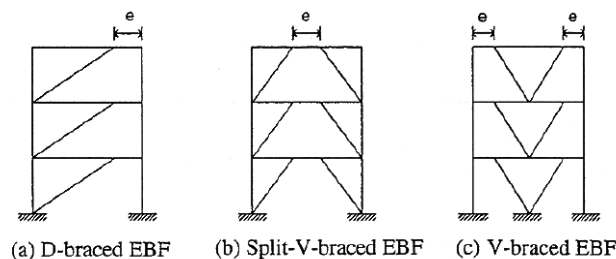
Eccentrically braced frames configurations, the scope of C6.15.5.1 being restricted to split-V configuration (case b).
